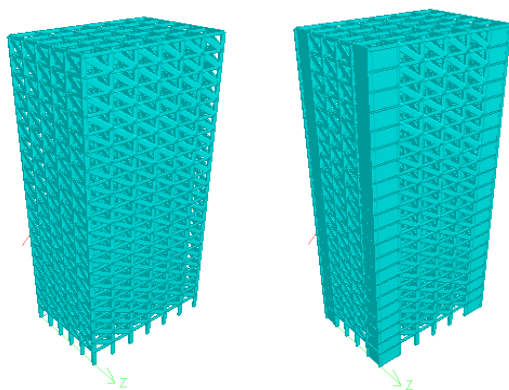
Infilled Frame and Infilled Frame with Shear Wall
